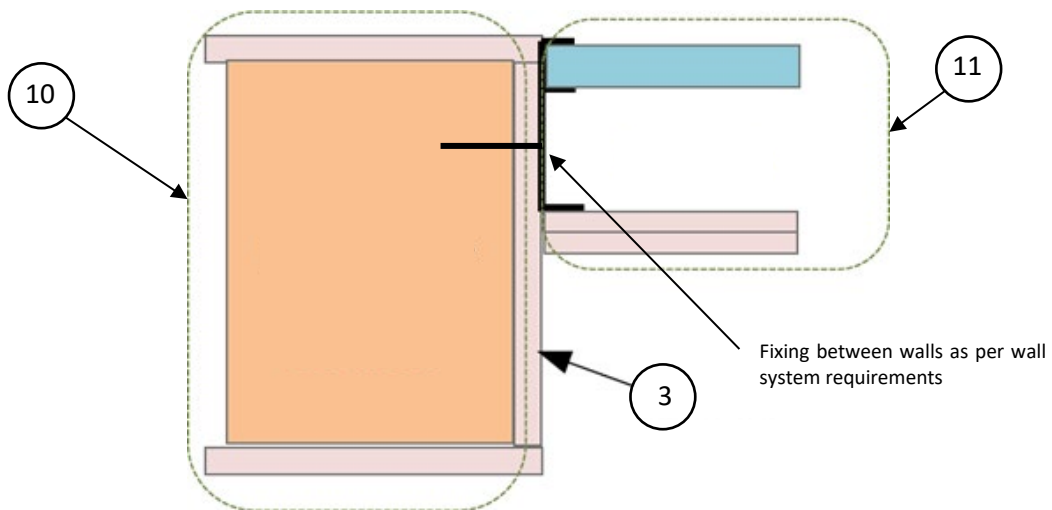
Steel stud shaft wall parallel interface with massive timber wall – Plan view
